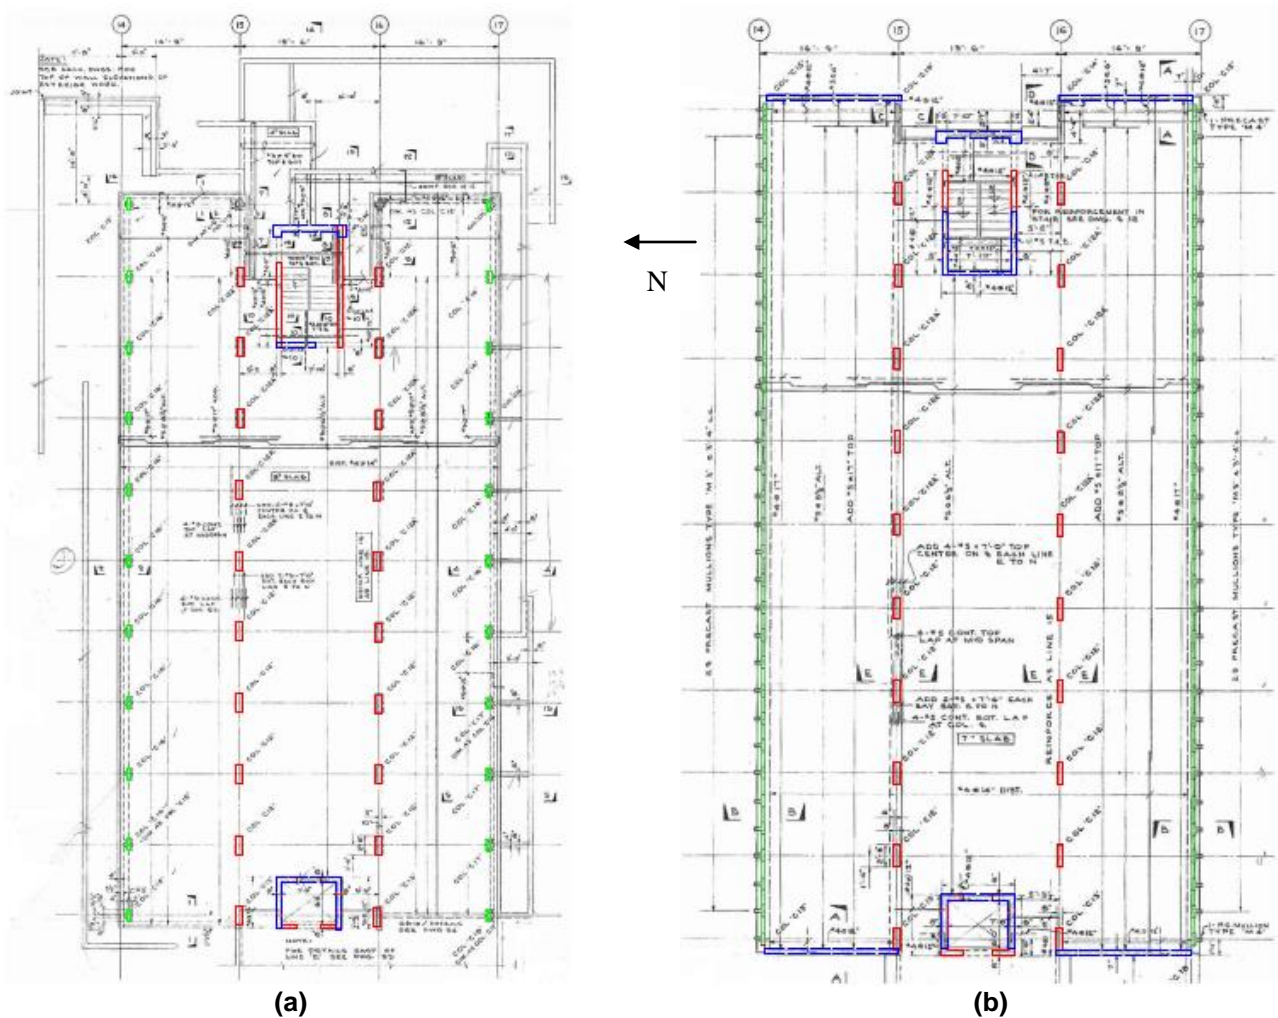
Example Building Floor Plan with LDRS and VLS Components Considered in Each Direction for (a) Ground Level and (b) a Typical Storey
